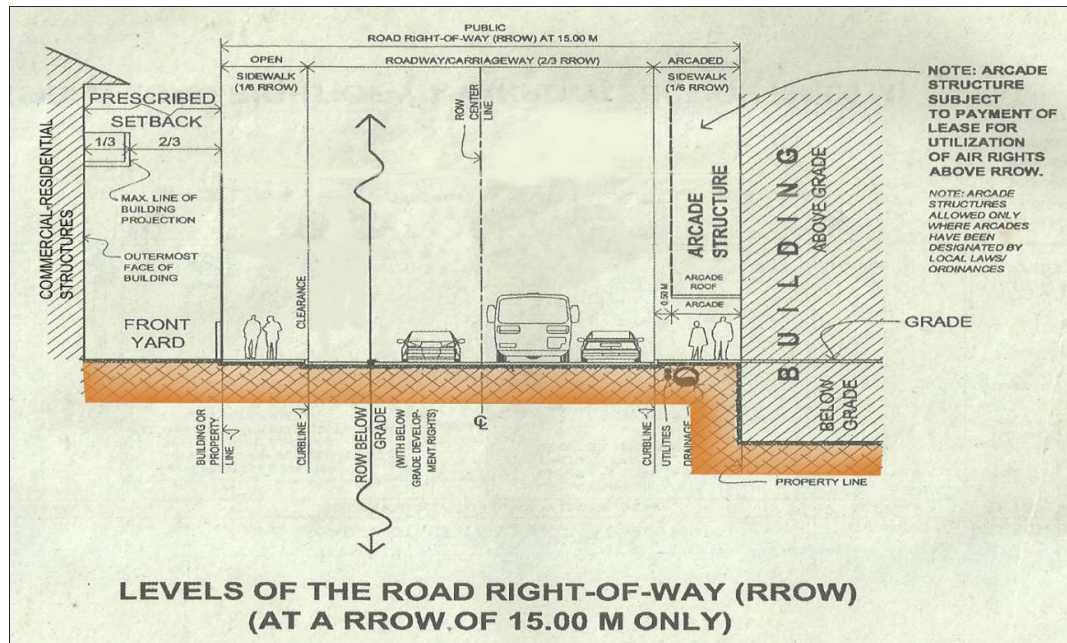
Road Right-of-Way on Minor Roads specifically Municipal Roads
